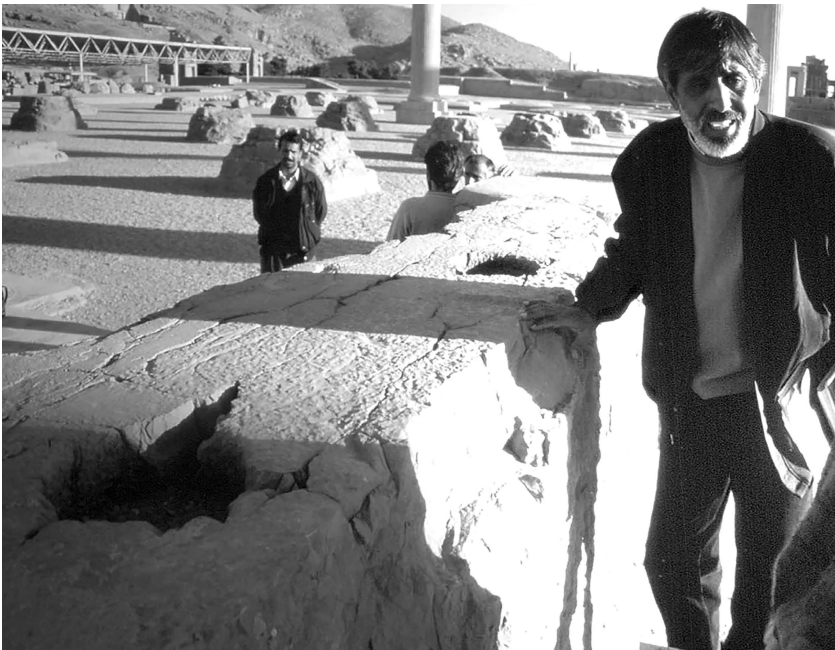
Apadana western wall, cavities for installing vertical wooden posts for wall consolidation (1998)
